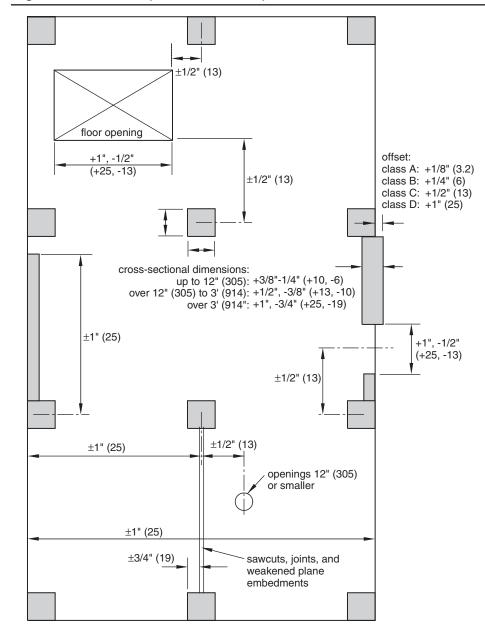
Cast-in-place concrete plan tolerances 03 05 05
